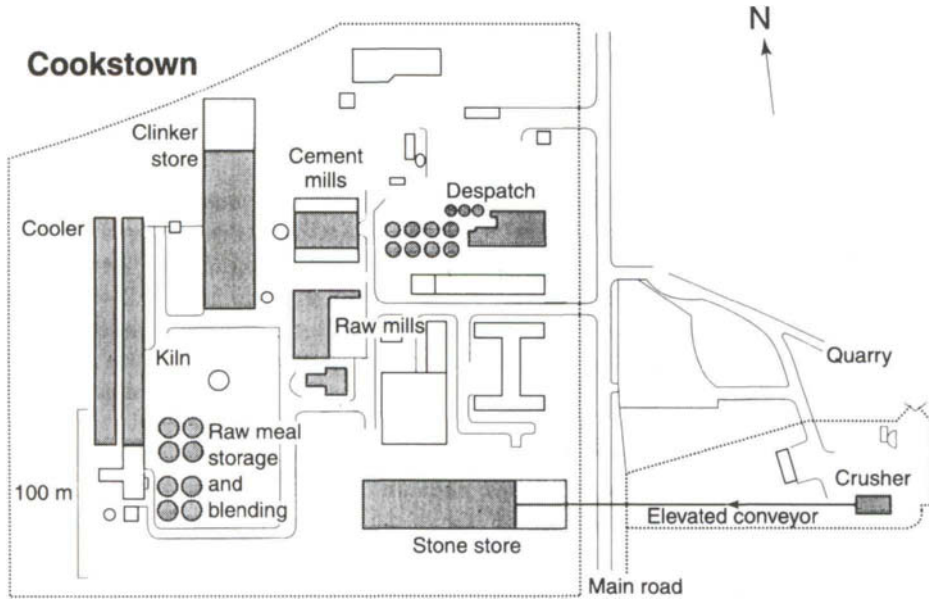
A typical layout for a cement-making plant (after Watson D, Armitage FH, Male CE. Principles of layout design. In: *Process Technology of Cement Manufacturing*, VDZ Congress, 1985, Bauverlag).
